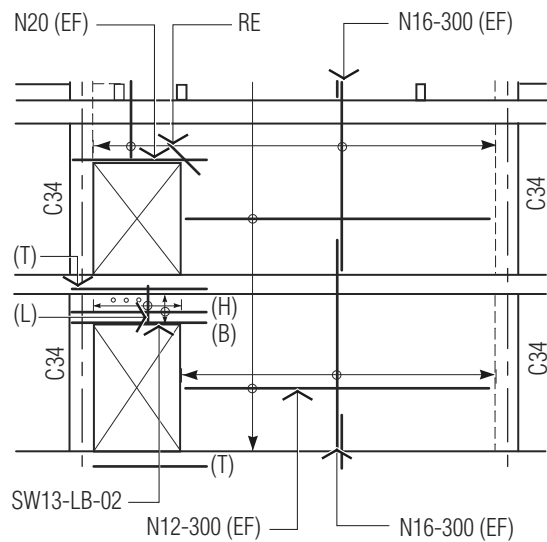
This figure shows the elevation of an internal wall with two layers of reinforcement in each face and a header beam over the door opening.
